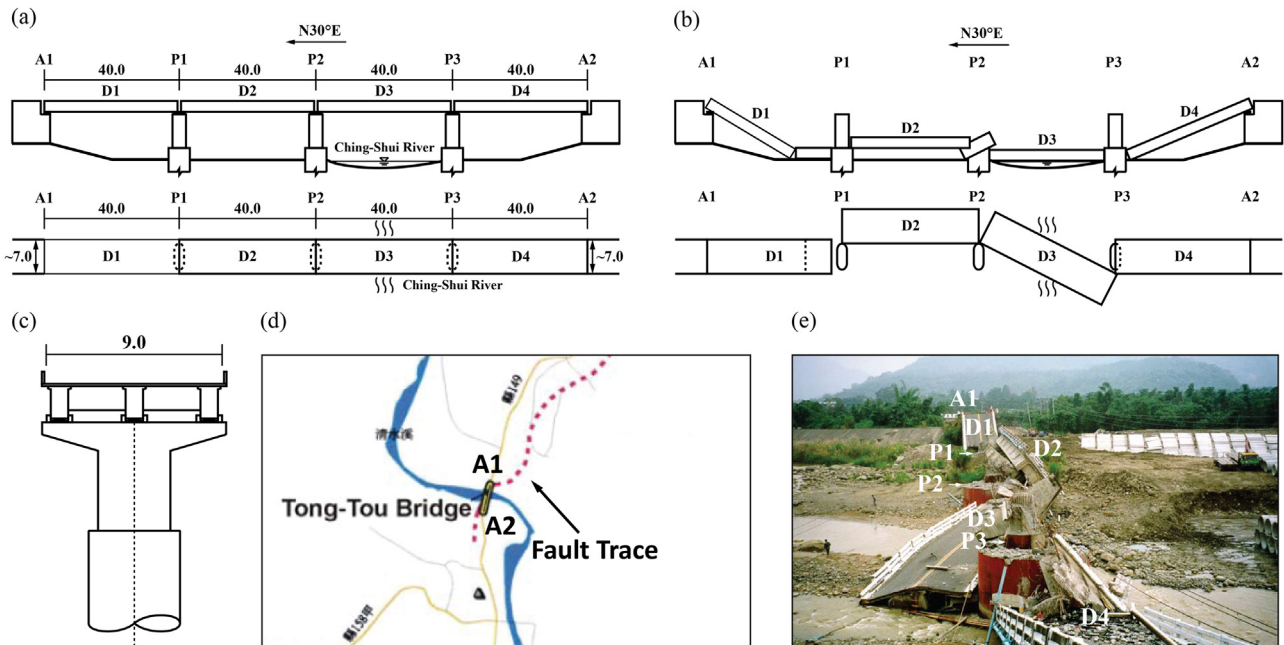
Tong-Tou Bridge during the 1999 Chi-Chi earthquake: (a) elevation and plan views of original bridge (unit: m); (b) elevation and plan views of collapsed bridge; (c) typical section of bridge (unit: m); (d) map showing bridge crossed by surface fault rupture; (e) collapsed bridge (Fig. 11d and e is modified from Buckle and Chang [15]).
